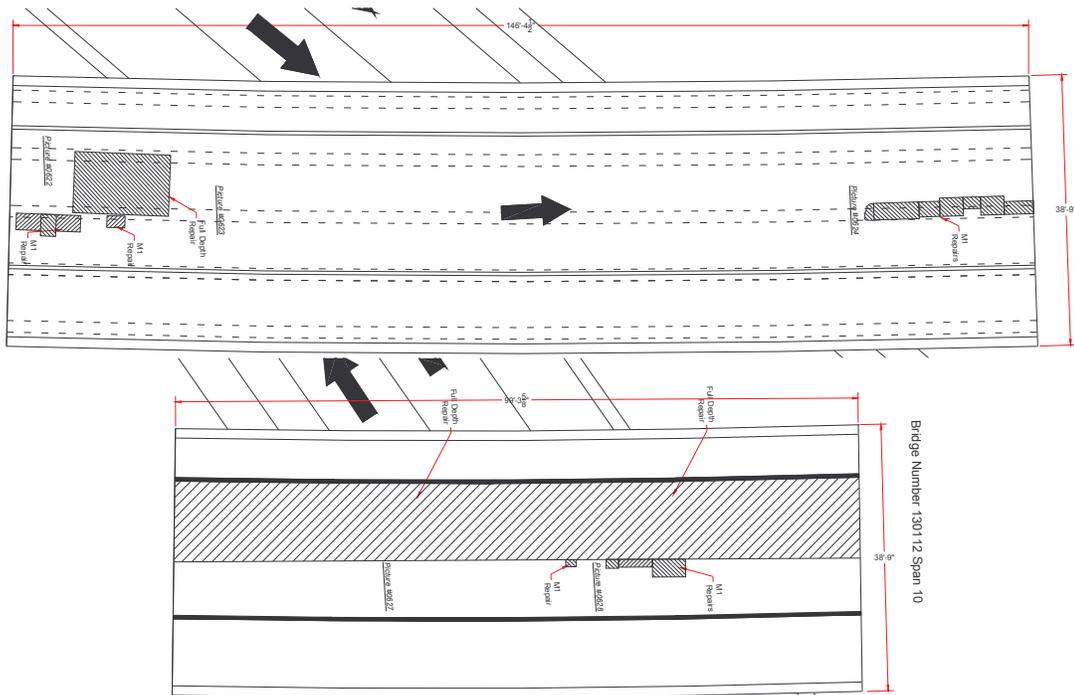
Deterioration in Bridge #130112 (March 2004)
